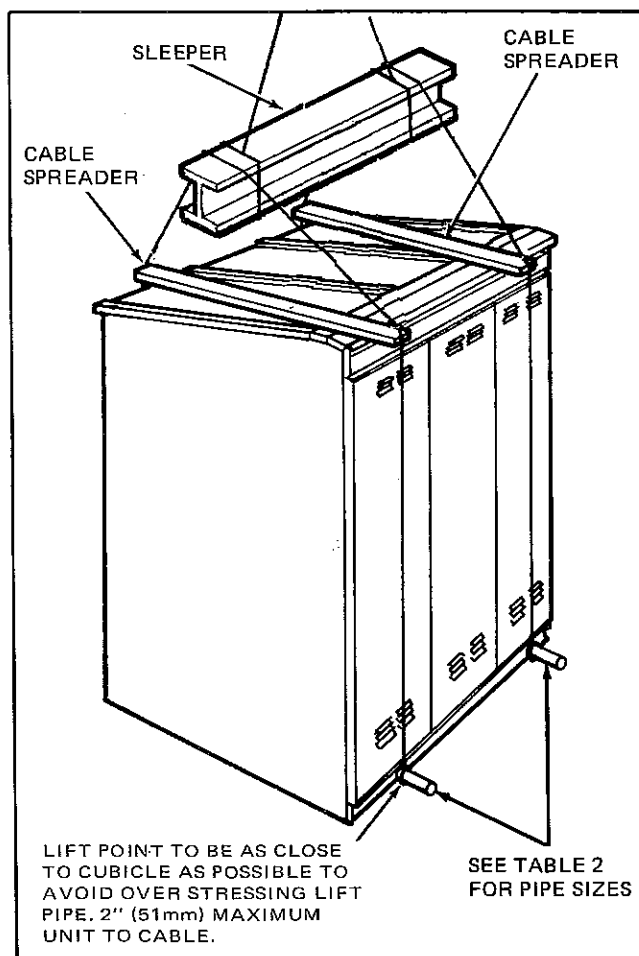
Lifting 5 and 15 Shelter-Clad and 5 kV Conventional Outdoor Switchgear
